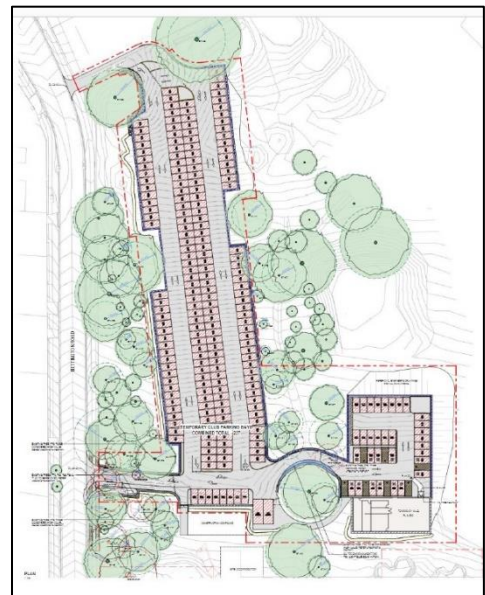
Proposed temporary car park and club house (Source: Architectural Plans Mirvac November 2022)
